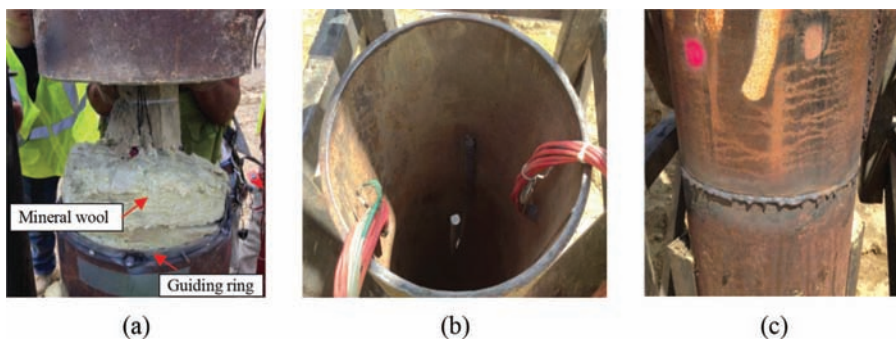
Details of the two-segment pile driving process: (a) guiding ring and mineral wool layers used for splicing of the two pipe pile segments and heat isolation, respectively; (b) rebar hook used to fasten cables originating from the bottom pile segment inside the top pile segment; and (c) welded pile segments.
